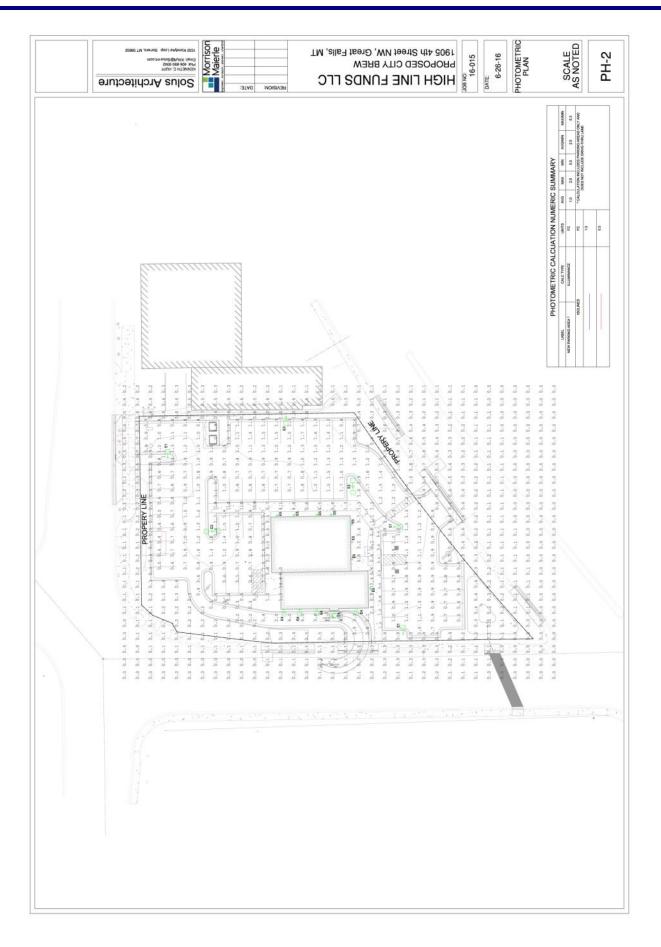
EXHIBIT K—PARKING PLAN (1ST SUBMITTAL)
